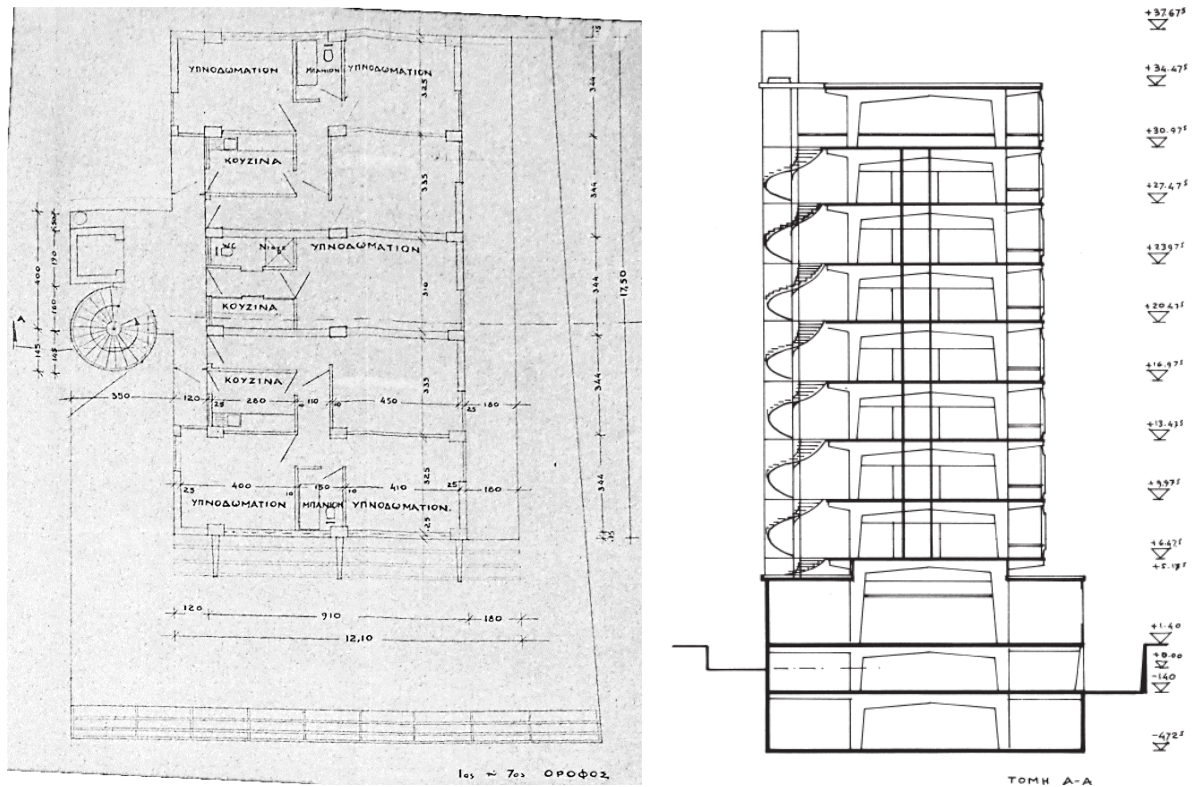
Original typical floor plan layout (left) and section view of the building (right) [7]
